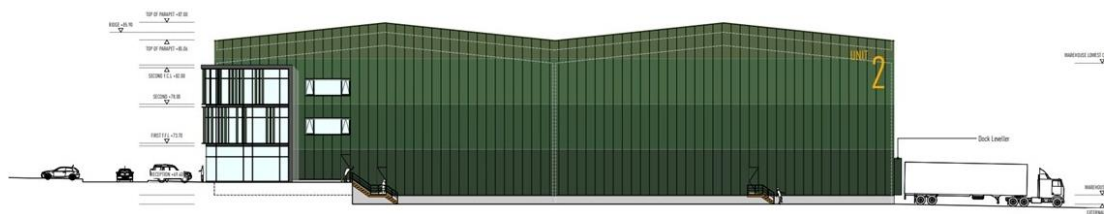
Proposed Unit 2 East Elevation (indicative only)
